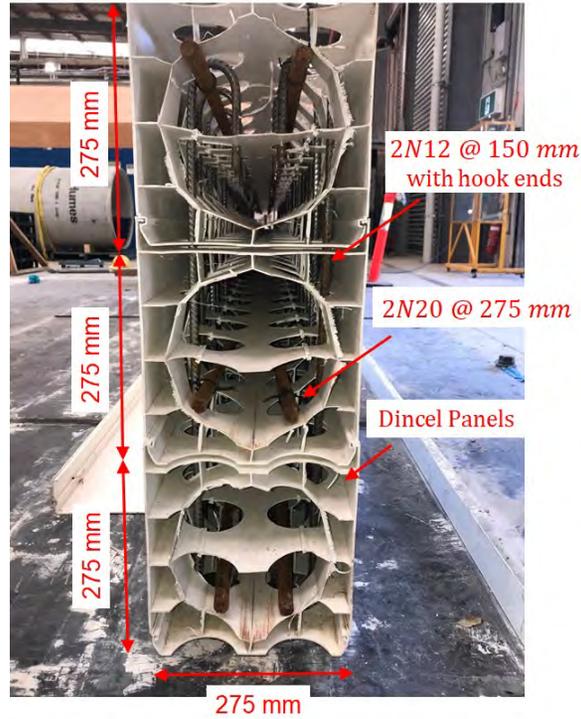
Front view of a Dintel Polymer encased wall with steel reinforcements
